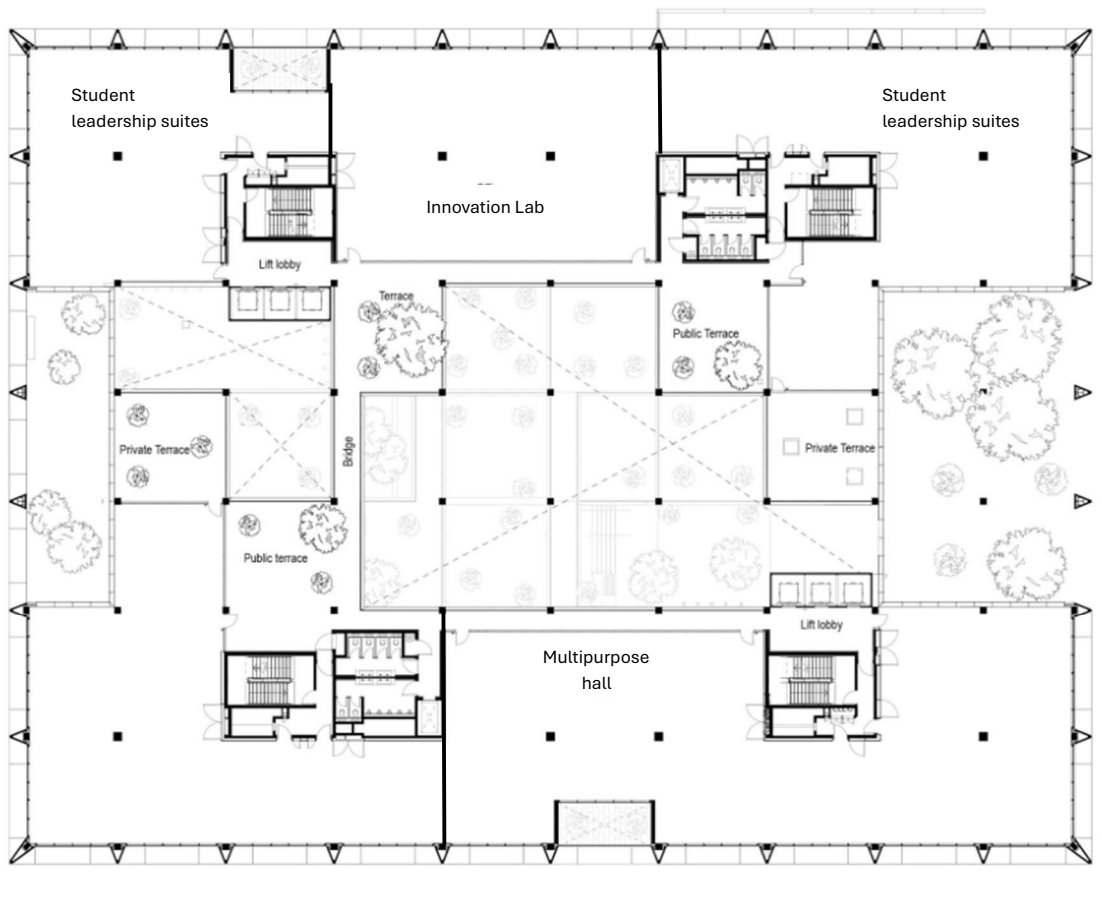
Third Floor Plan (Modification of the original plan of Norman Foster's design.)
